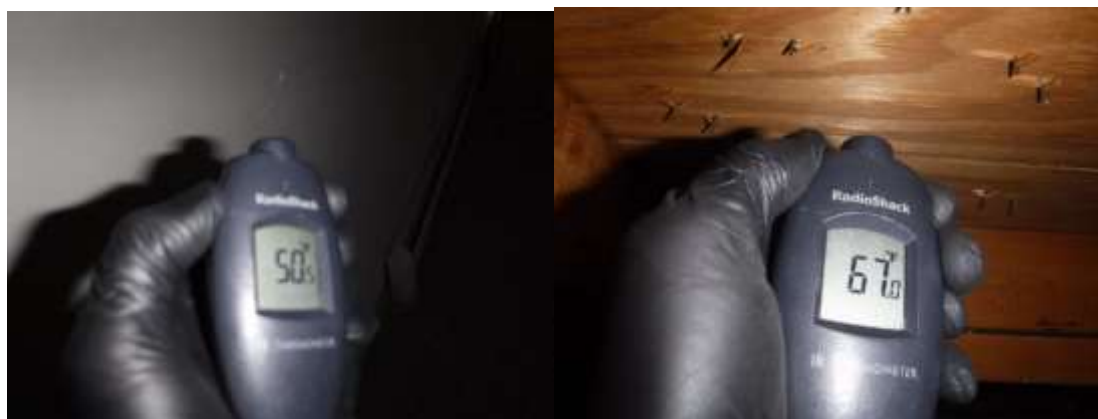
Almost 20F hotter in attic and 50F in house and outside; poor ventilation.
